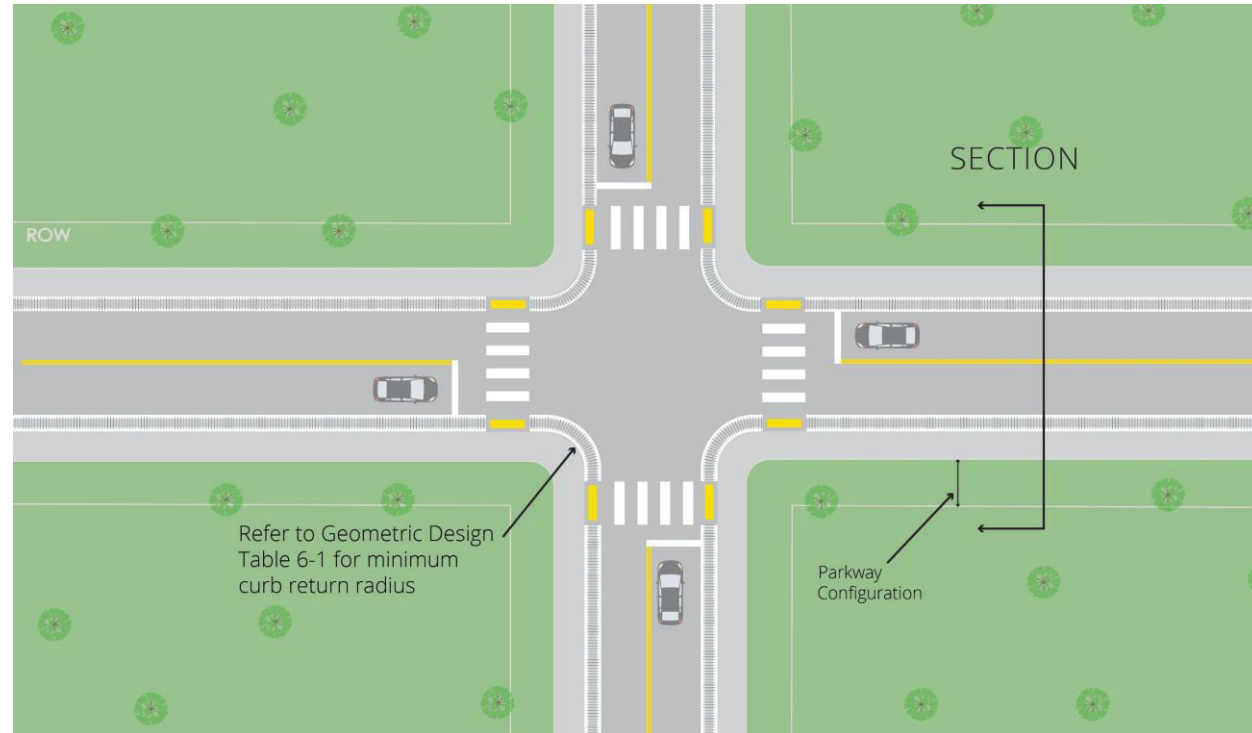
RURAL COLLECTOR ROAD PLAN VIEW (OPTION C2)
